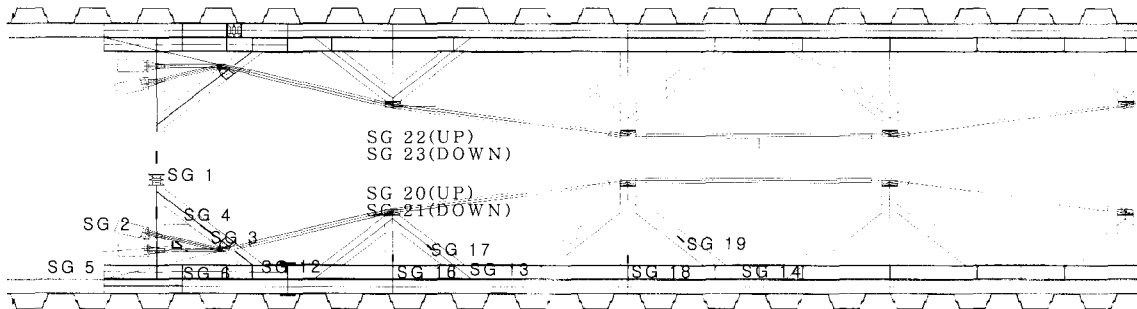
Full-scale test wall-plan view(at location of strain gauge)
